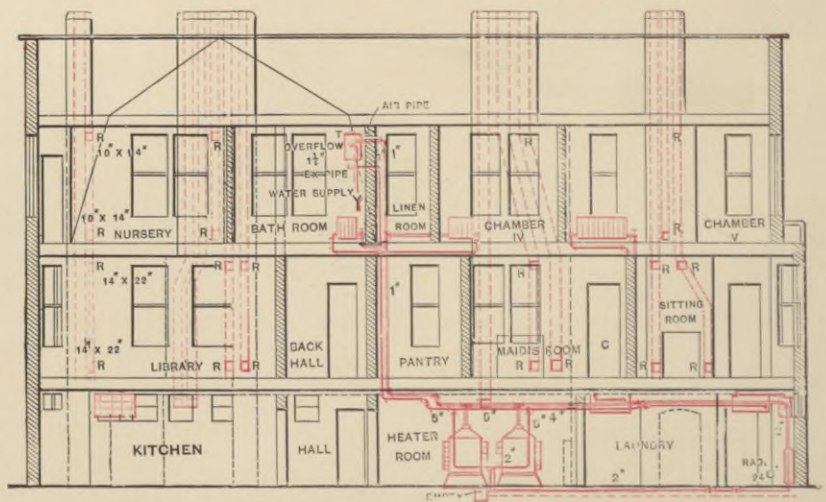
Sectional Longitudinal Elevation. Scale  $\frac{1}{16}$  inch to the foot.
